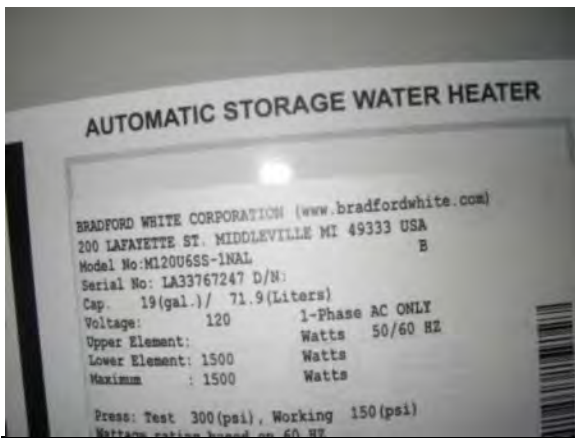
1902 BUILDING 2ND FLOOR RESTROOM WATER HEATER INFO
